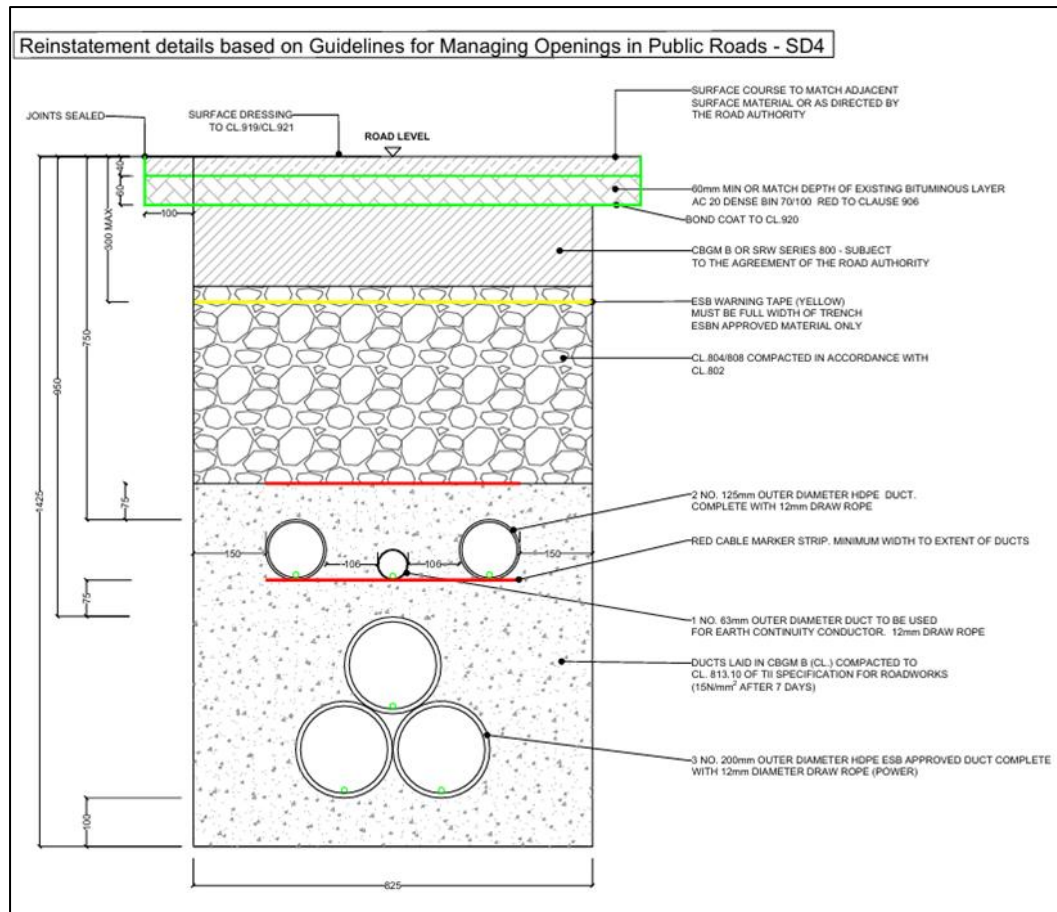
Typical Installation in Roadway for 220kV UGC Grid Connection
